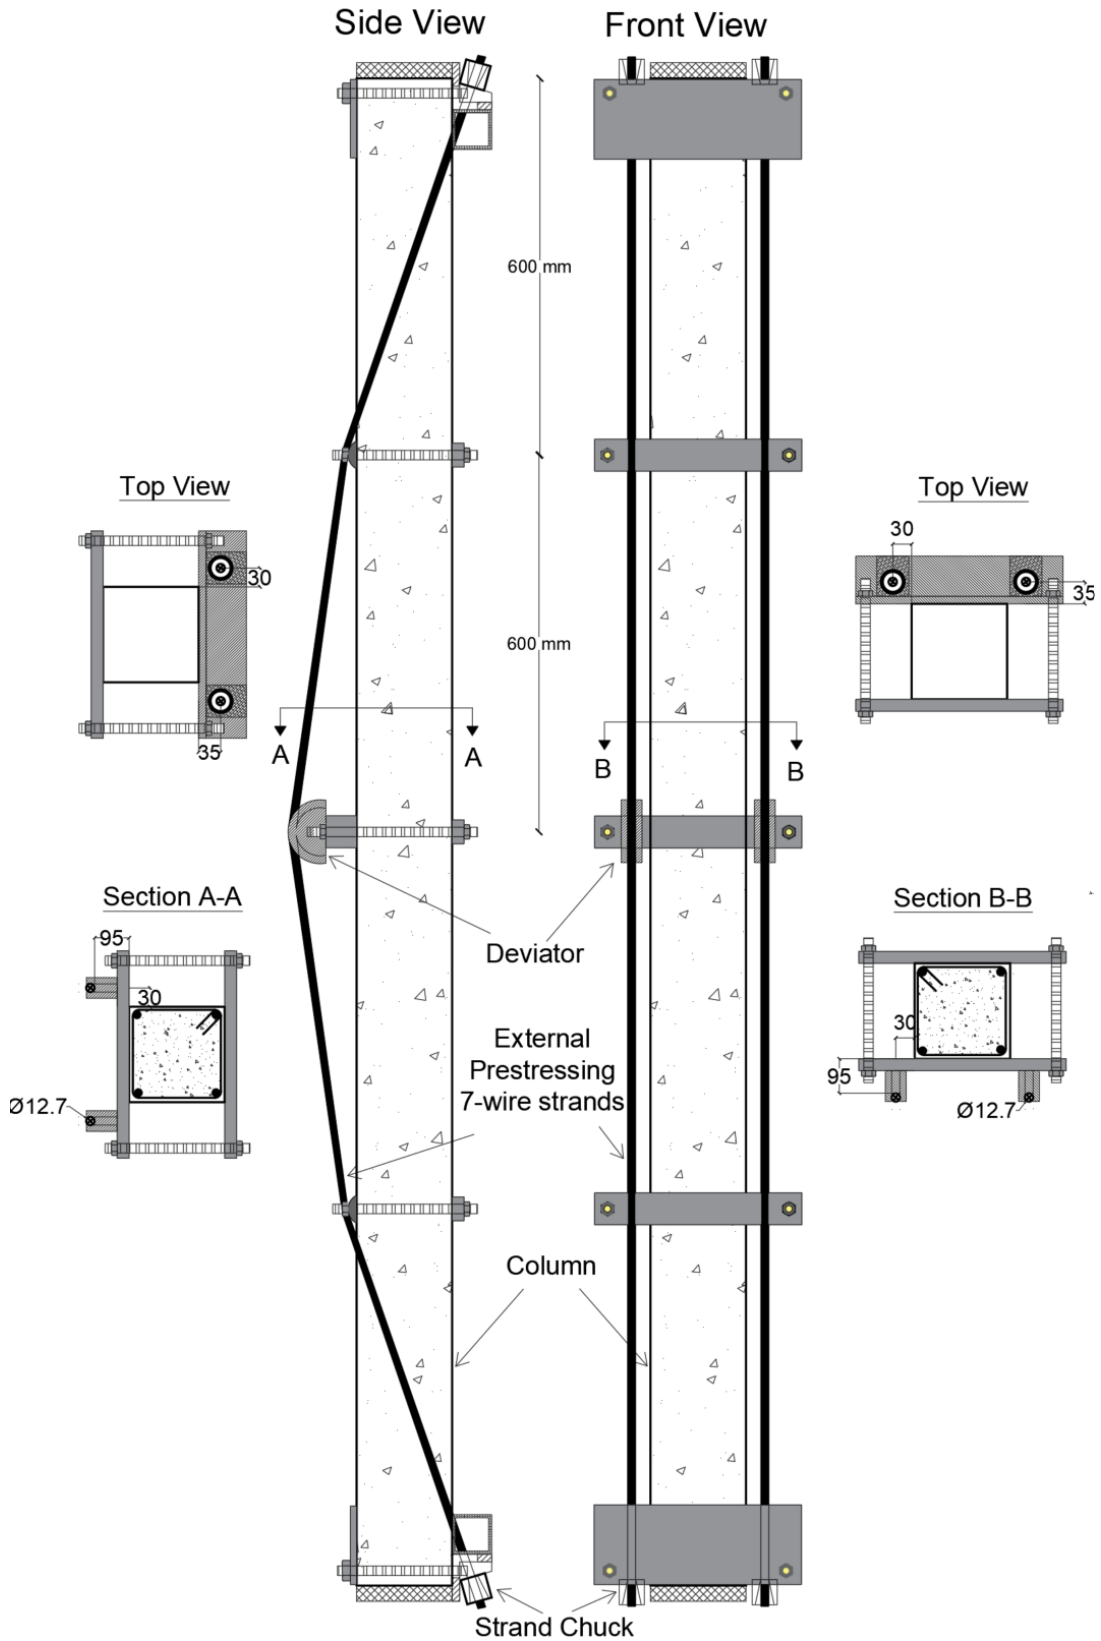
Column with two external prestressing strands having a triple-harped (semi-parabolic) profile.
